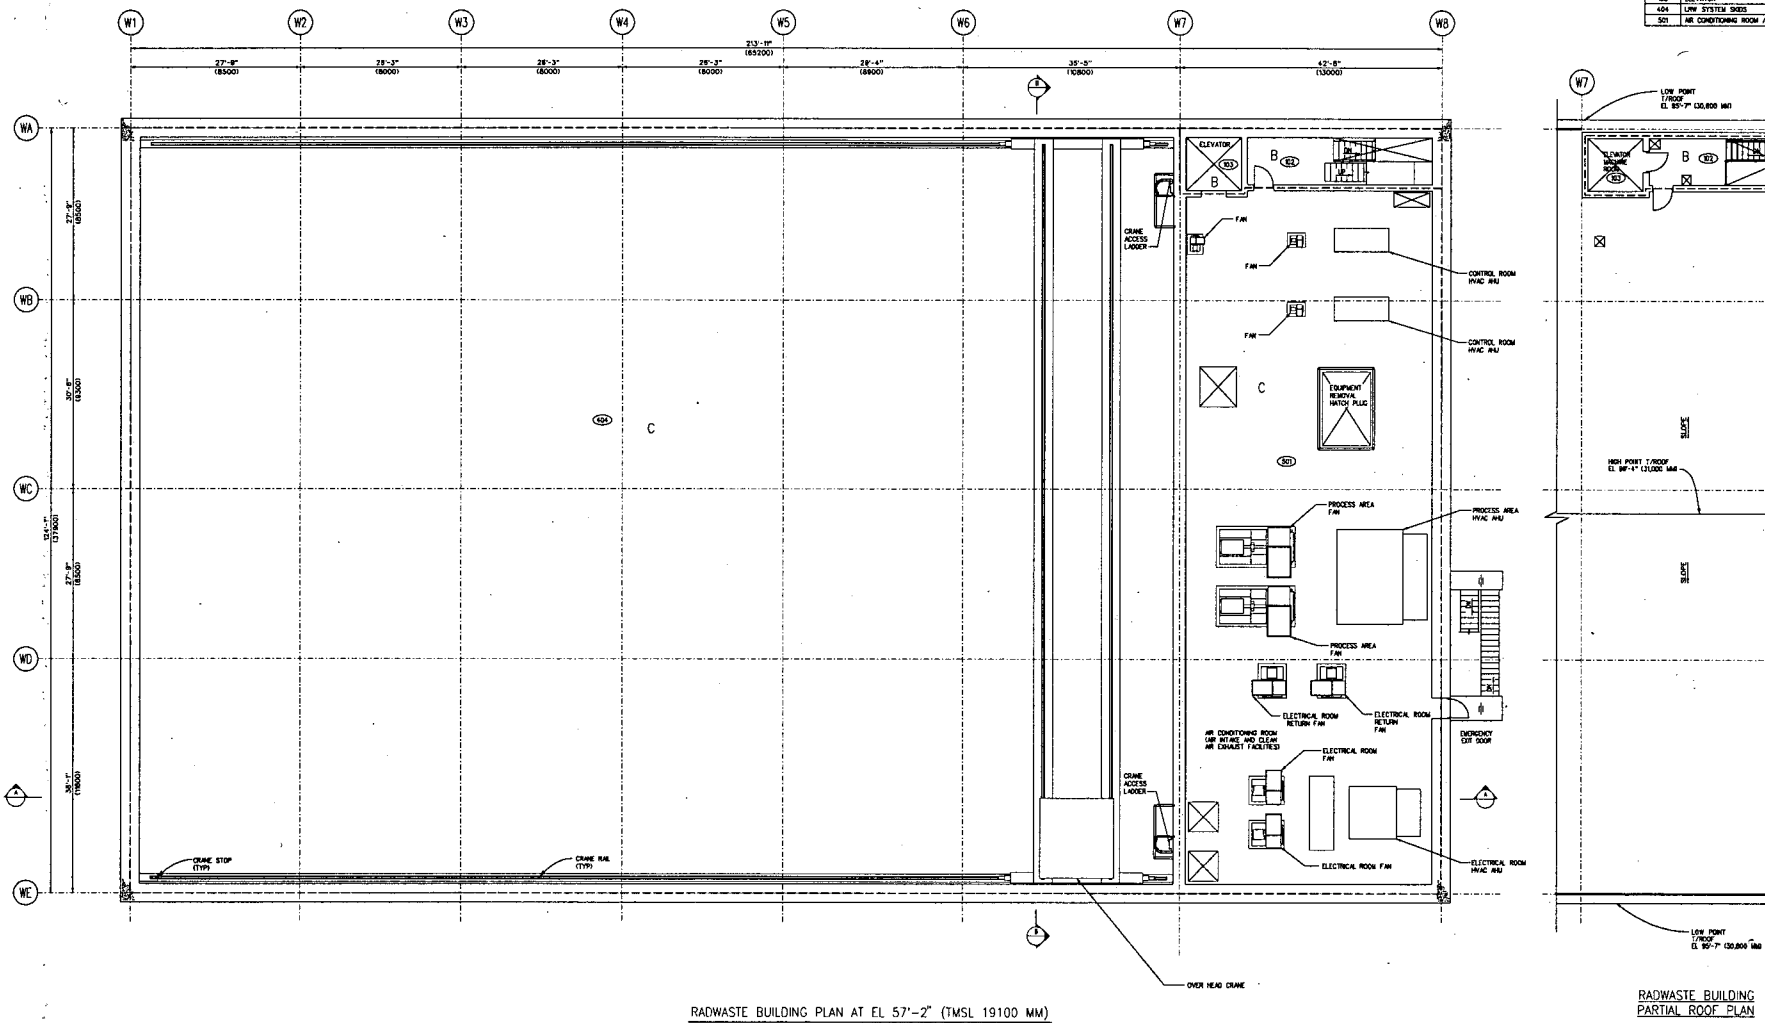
RADWASTE BUILDING, RADIATION ZONE MAP, NORMAL OPERATION AT ELEVATION 19100 MM
